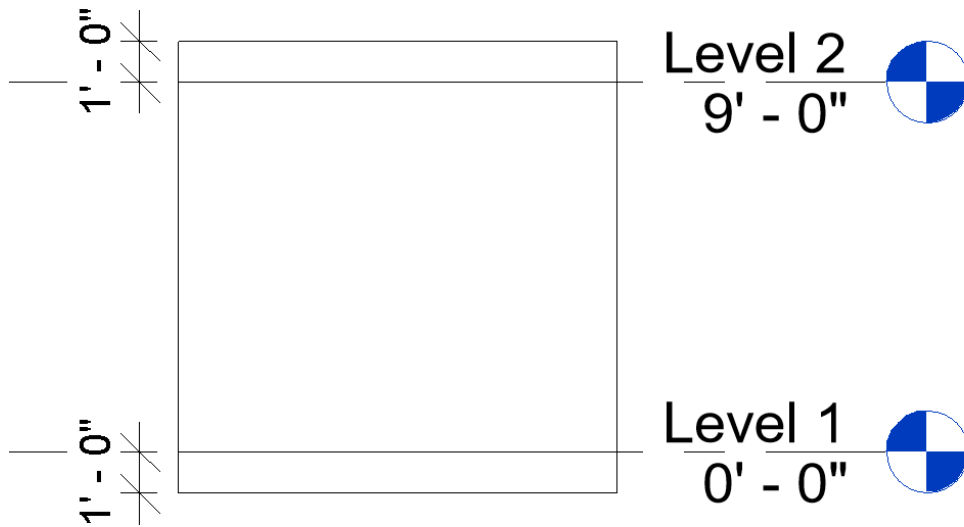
shows a typical section view to indicate positions and dimensions of the slab floor, the height of the roof and the ceiling element.
